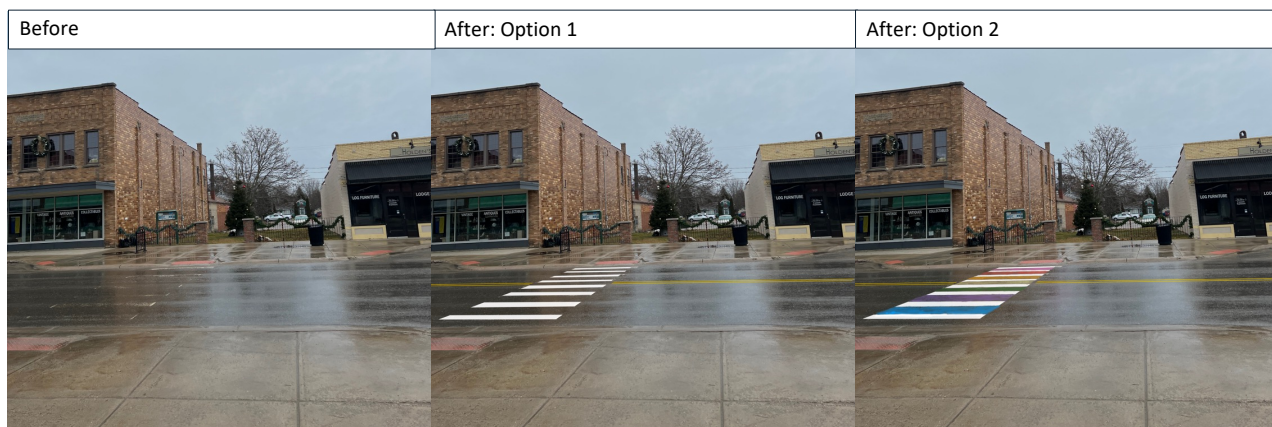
Before and After Image: Scottville downtown colored crosswalk markings
